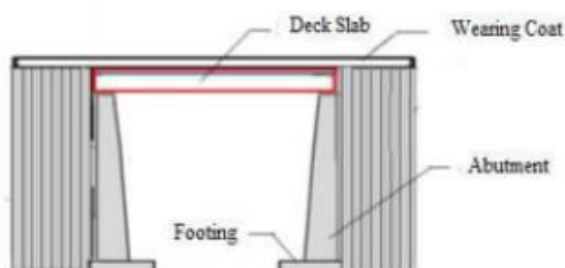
Longitudinal section of Solid Deck Slab.
